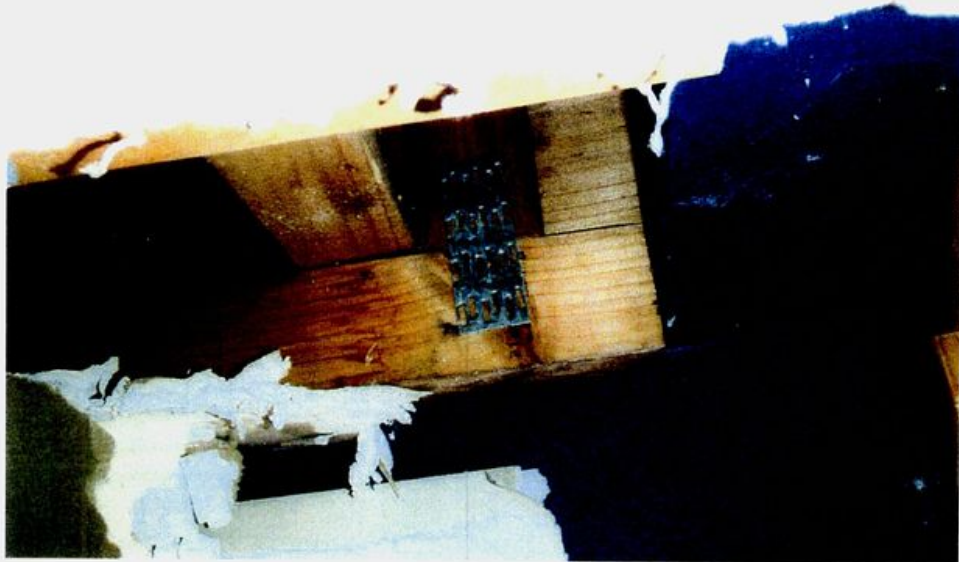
Junction of east west beam under north wall of master bedroom and north south beam over wall meals to family showing no connection beam to beam.
